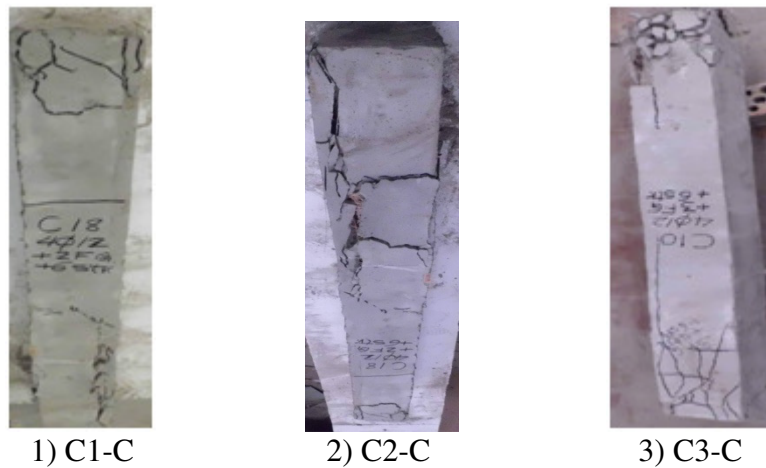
c): Cracking pattern; 1) C1-C; 2) C2-C; 3) C3-C
